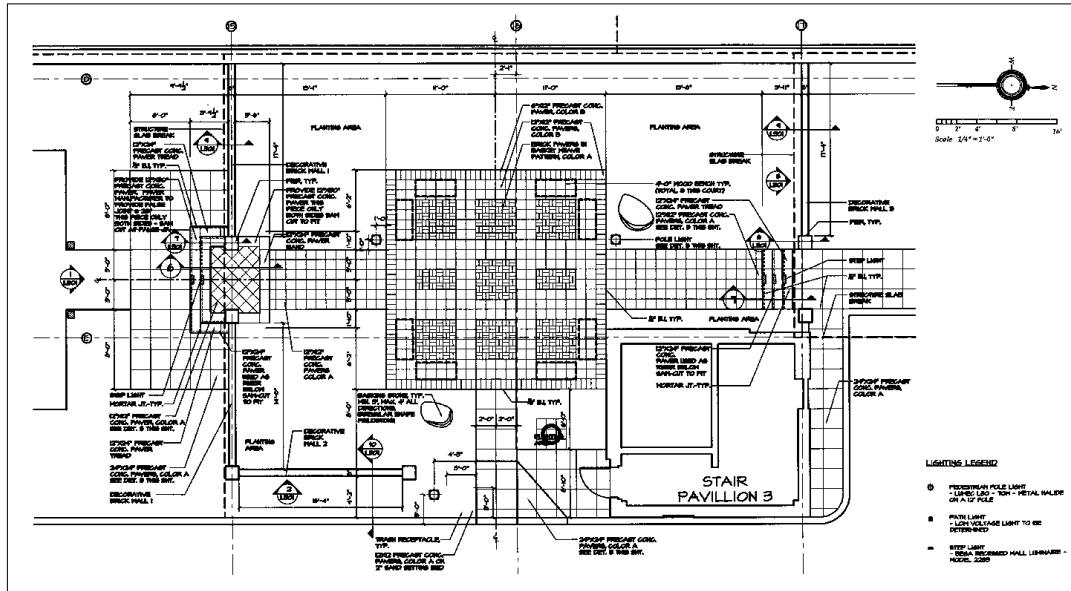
Layout Plan of the North Court/Butterfly Garden, Alban Towers Garage Rooftop Garden
